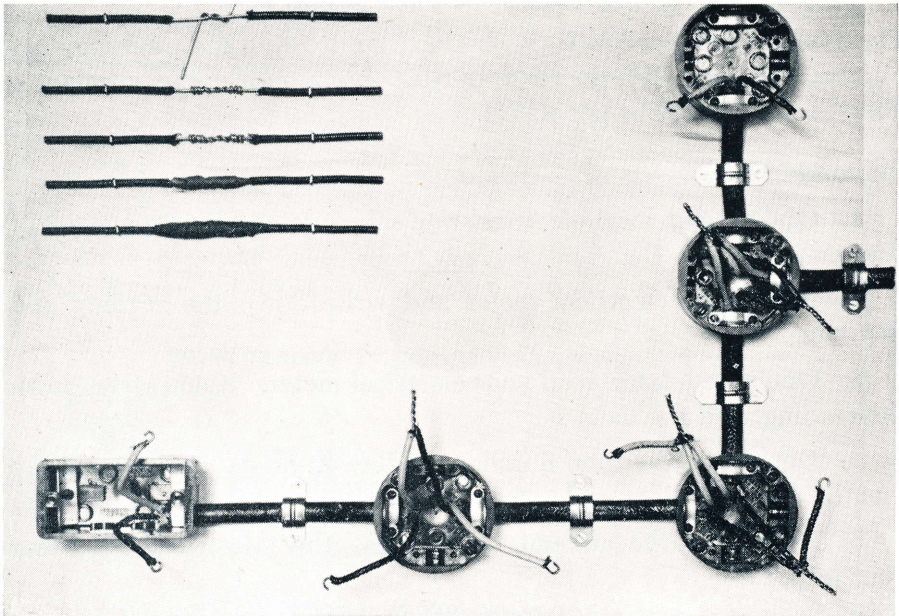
Panel partly completed to show wiring connections. The twisted connections on the indoor wiring should be bent, soldered, and taped before installing receptables as shown in Fig. 19.
